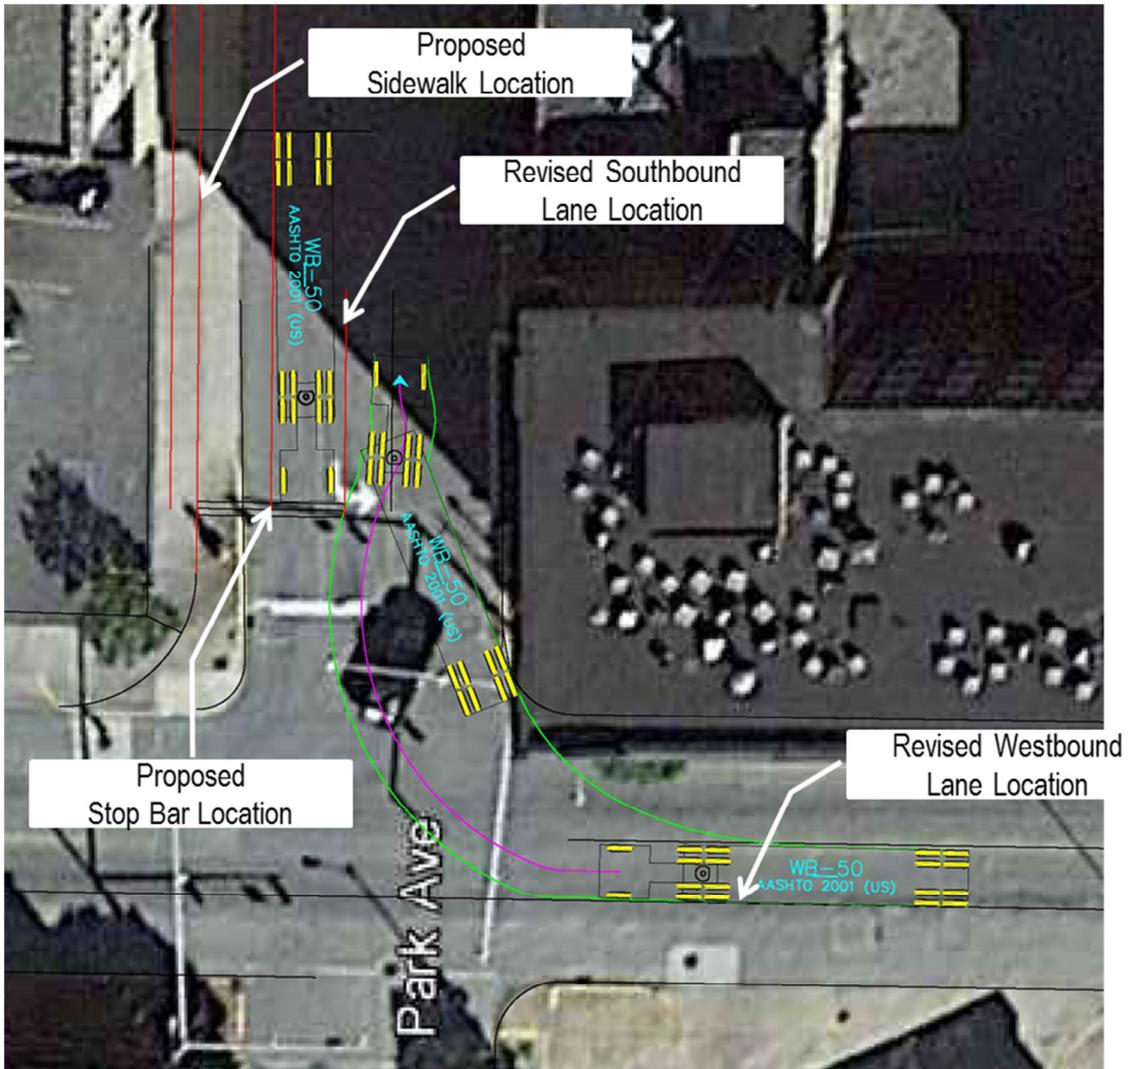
Recommended improvement for Park Ave. and 2nd Street Intersection
